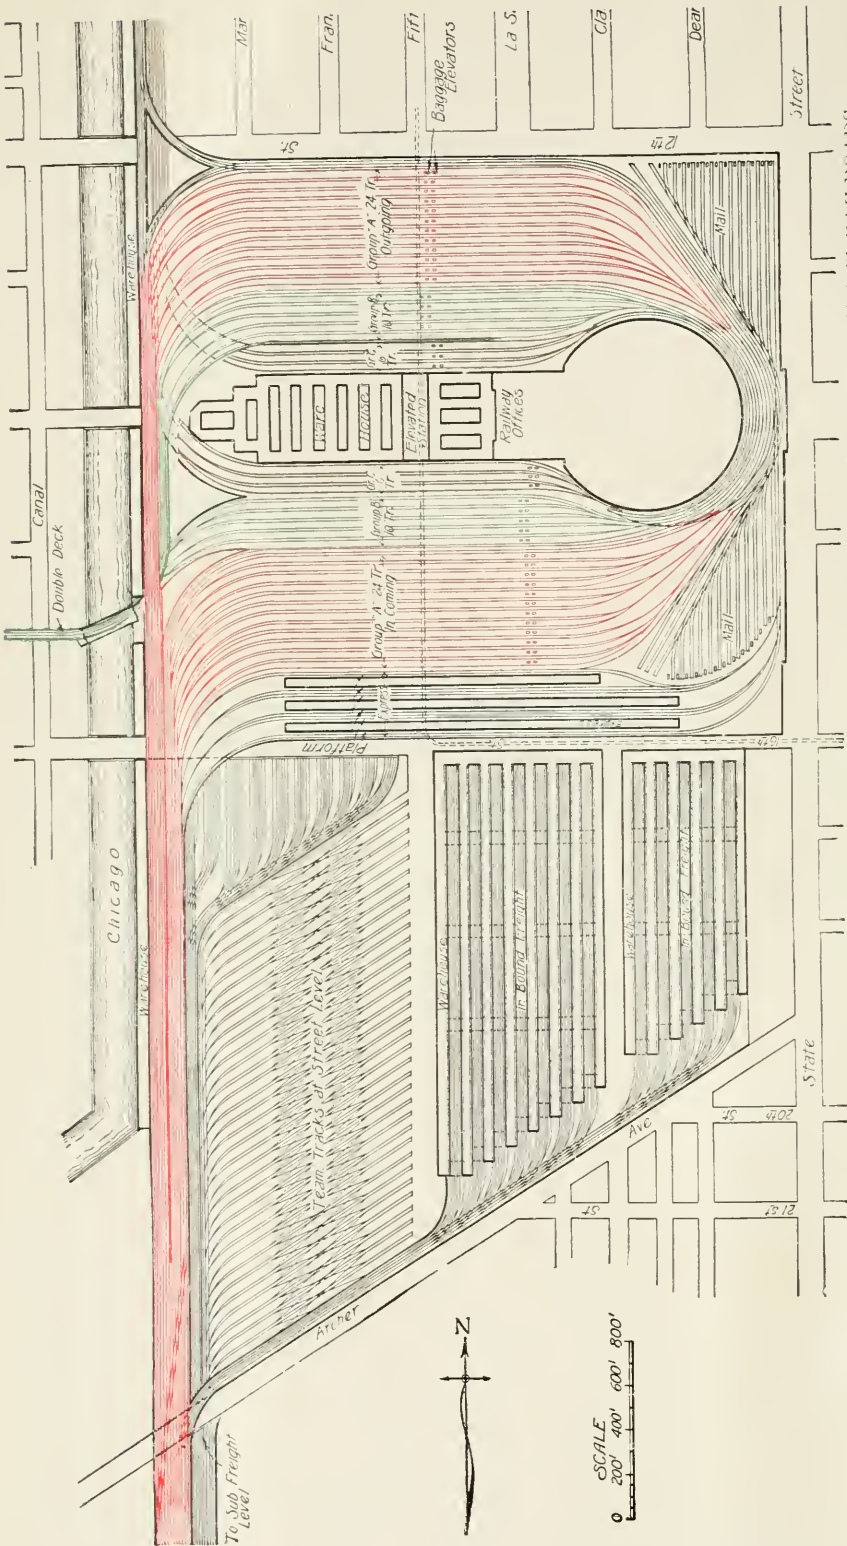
PROPOSED PLAN OF A GREAT CENTRAL TERMINAL AND DOWNTOWN LOOP FOR CHICAGO'S RAILROADS, BY MR. JARVIS HUNT.
